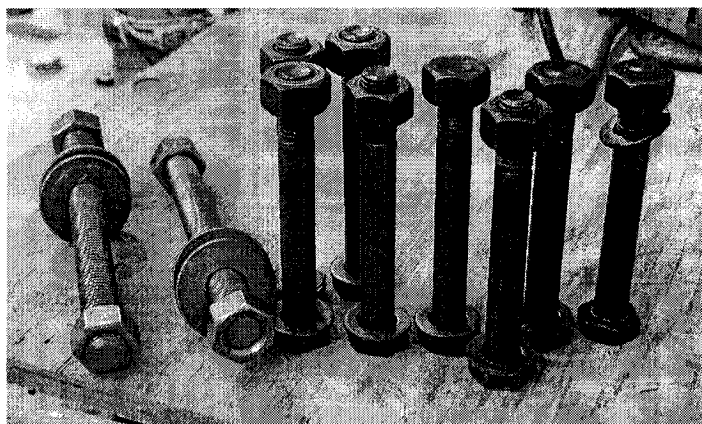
Shear anchors, top bolts, and hold-down anchors used to secure the shear wall test specimen to the testing apparatus
